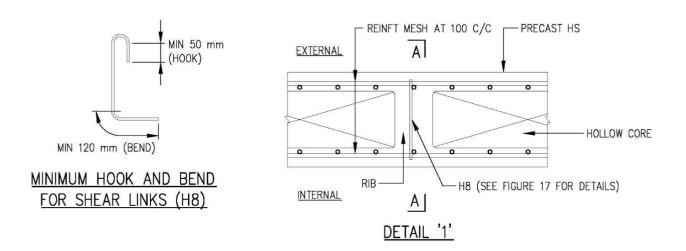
(a) REINFORCEMENT BAR DETAILS OF WALL, RIB AND HS DOOR ON LONG WALL OF PRECAST HS
